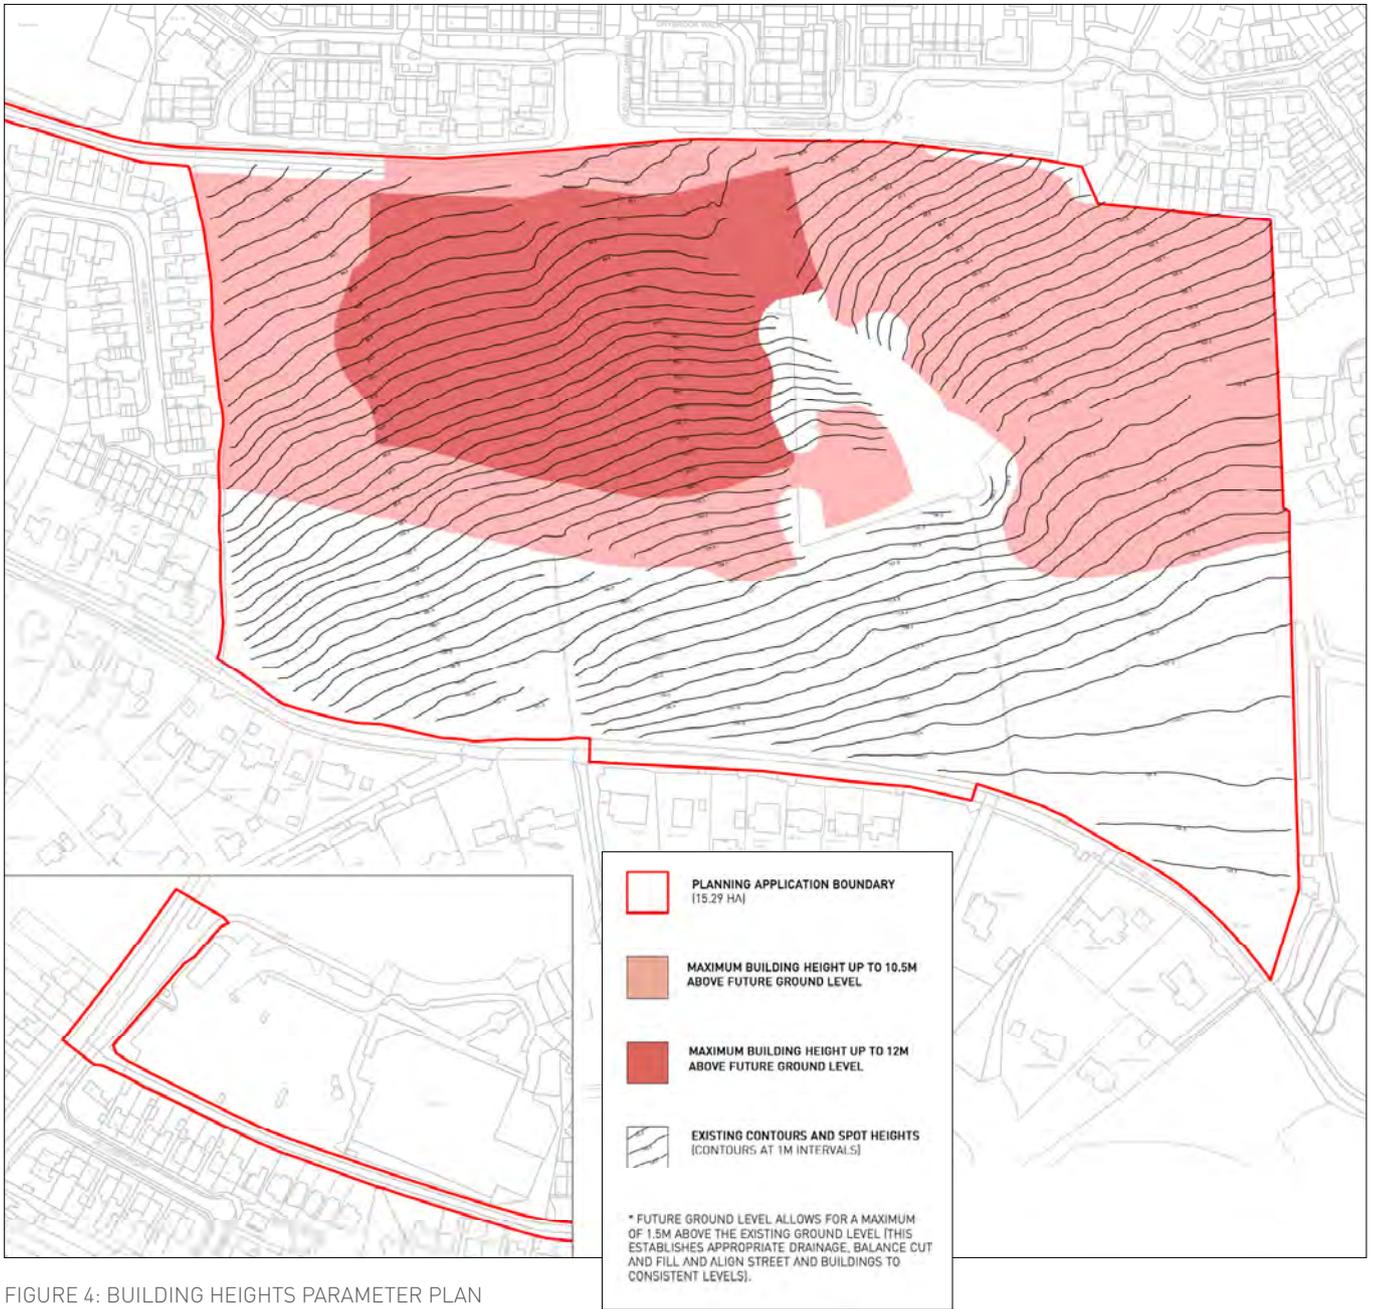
BUILDING HEIGHTS PARAMETER PLAN
